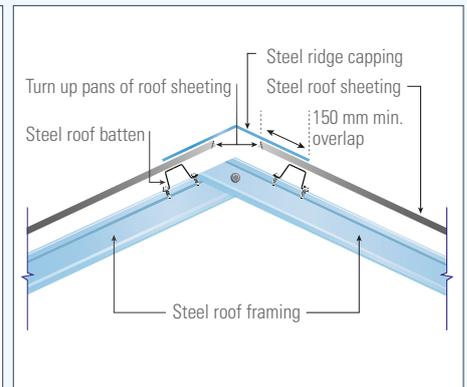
Roof system – ridge/hip details, BAL-12.5 to BAL-40
